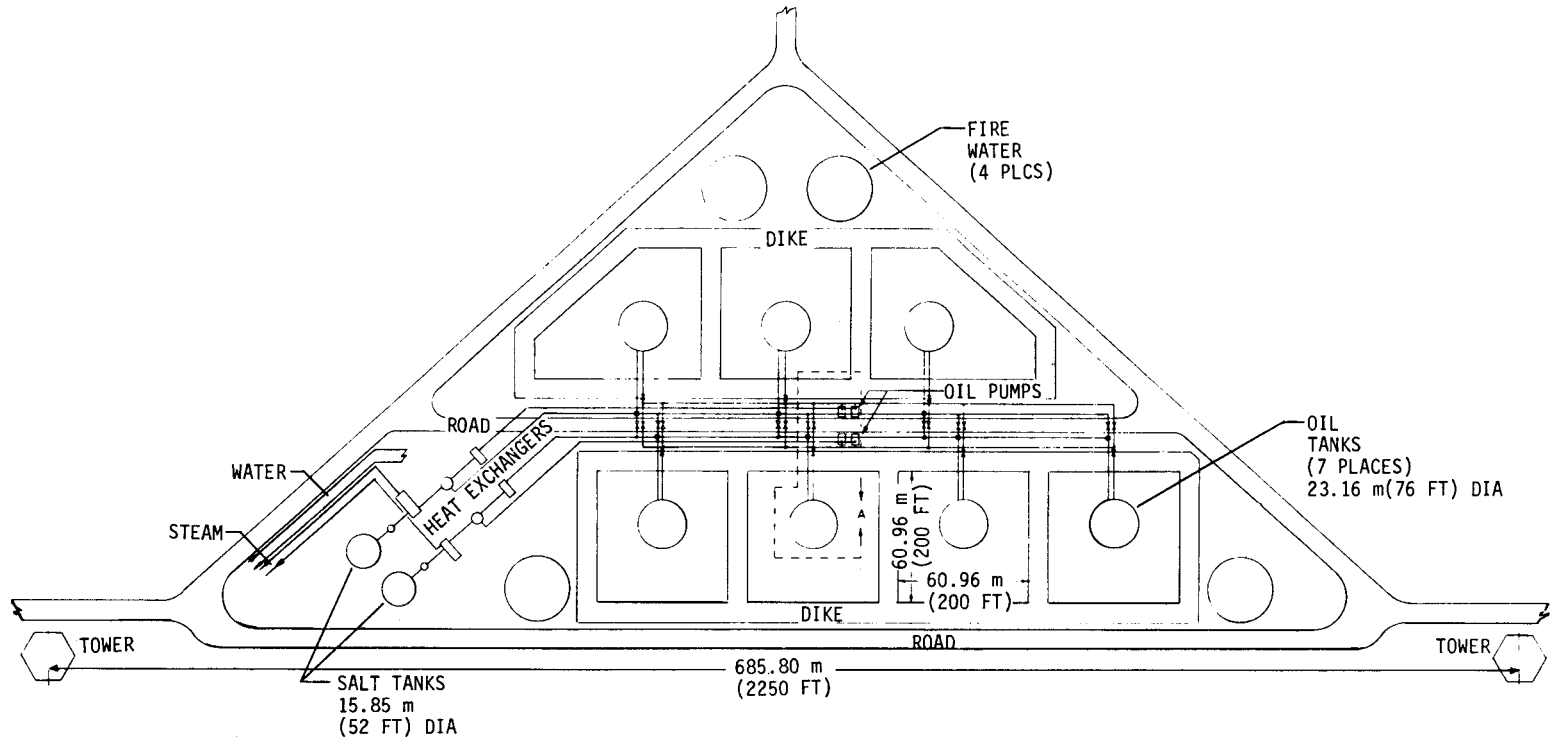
Commercial Plant Thermal Storage Subsystem Plot Plan
